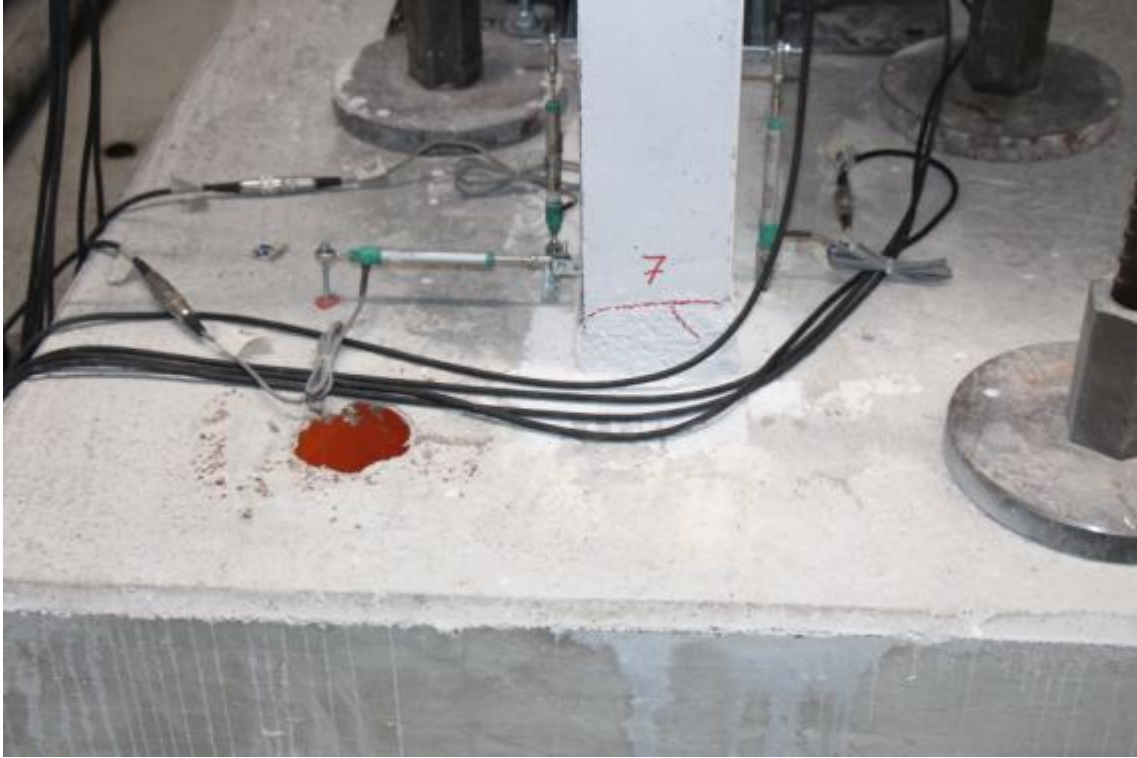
Detail of the crack pattern at the base of transversal walls – South side of the specimen.
